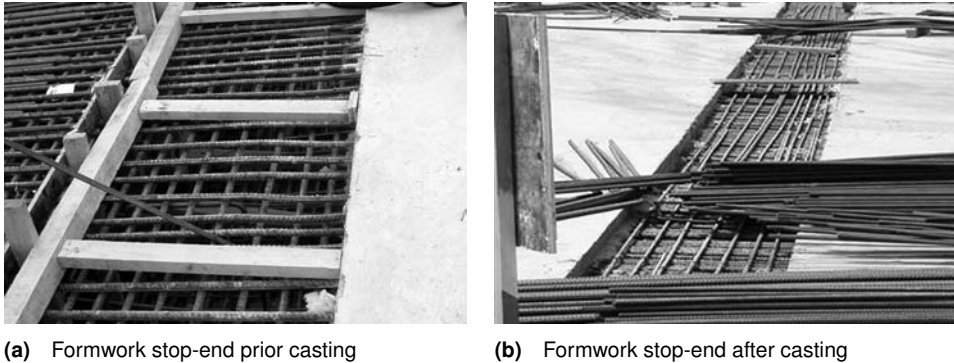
Wooden hand crafted stop-end for a settlement joint in a raft foundation, where the holes for the rebars are drilled through
